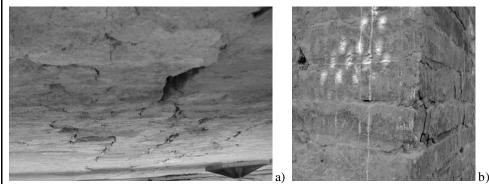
St. Giustina bell-tower. a) "natural" joint declaring the presence of the late brick wall adjoined; b) cracking and spalling of brick elements.
